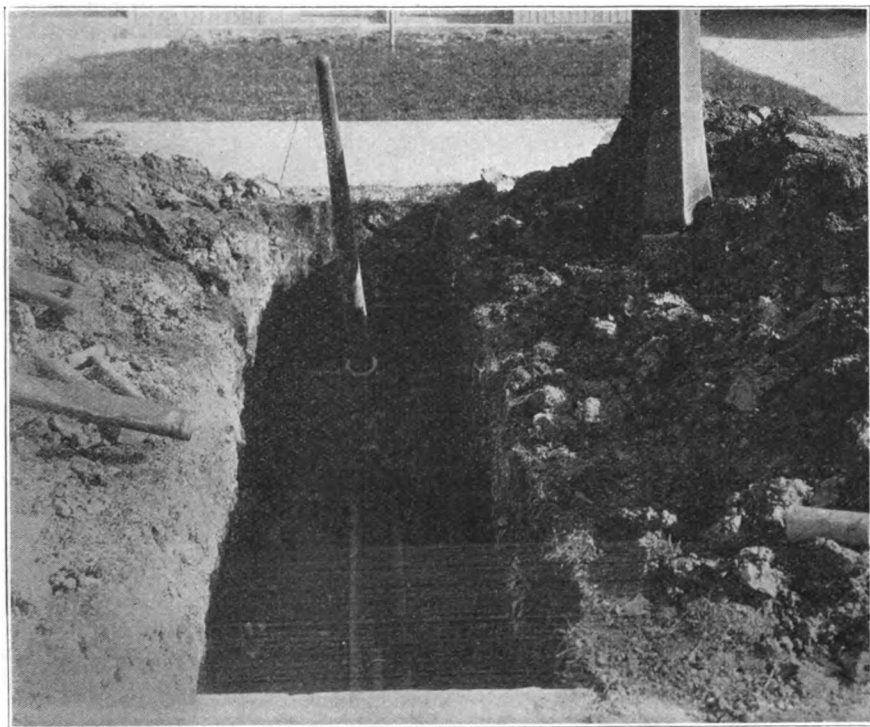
PUSHING THE PIPE UNDER THE STREET WITH A JACK SAVES TEARING UP THE PAVEMENT.
